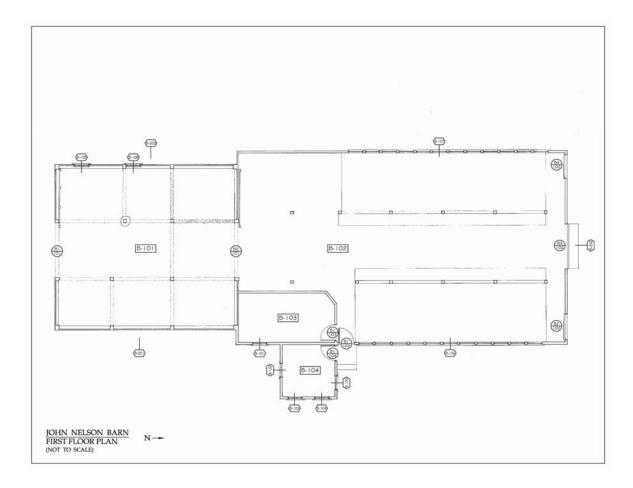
First Floor key plan (adapted from HABS drawings).
